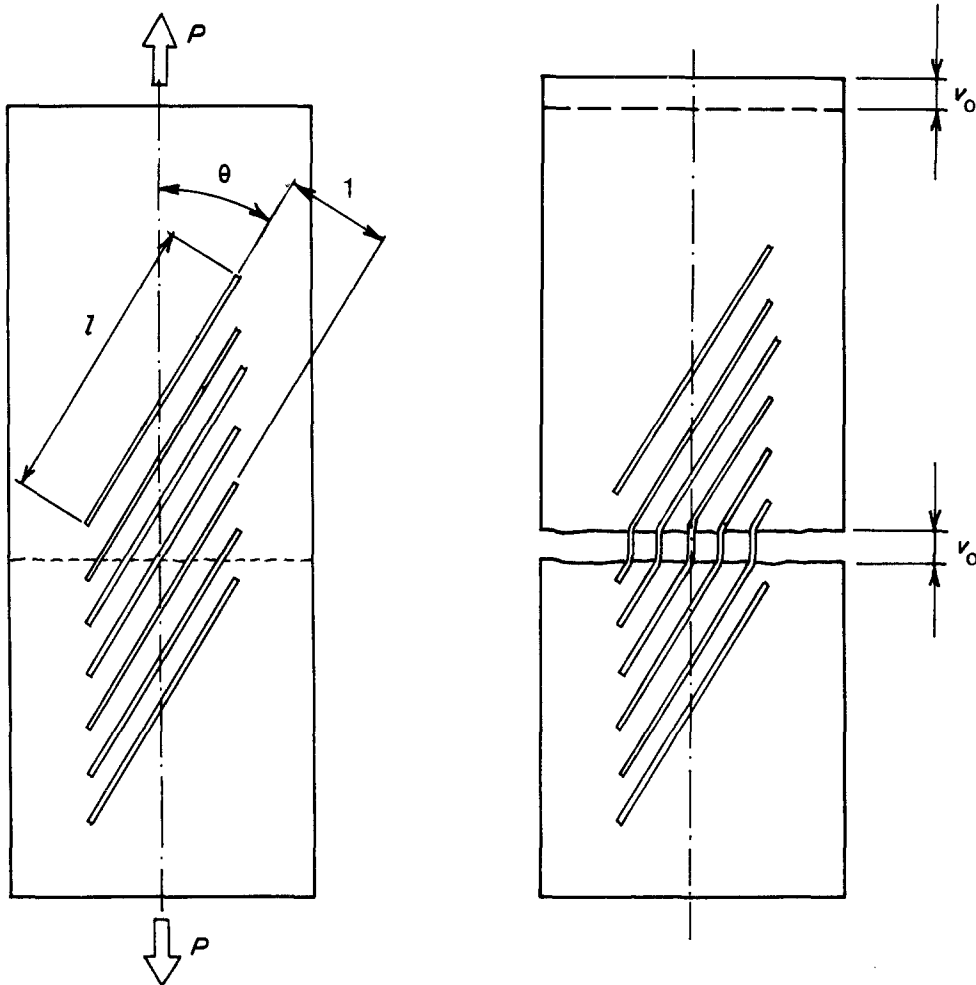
Fibre reinforced concrete element subject to tension before and after the crack opening.
